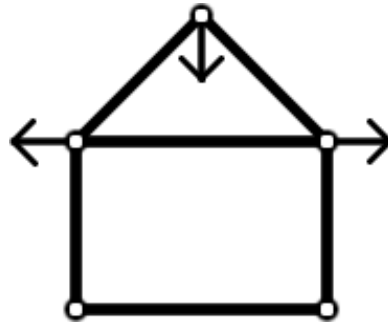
This simplified representation of the load-bearing elements of a house show how traditional construction techniques require additional material to be stable. Were it not for the horizontal piece which forms the ceiling, the walls would be forced outward by the forces caused by the weight of the roof.
